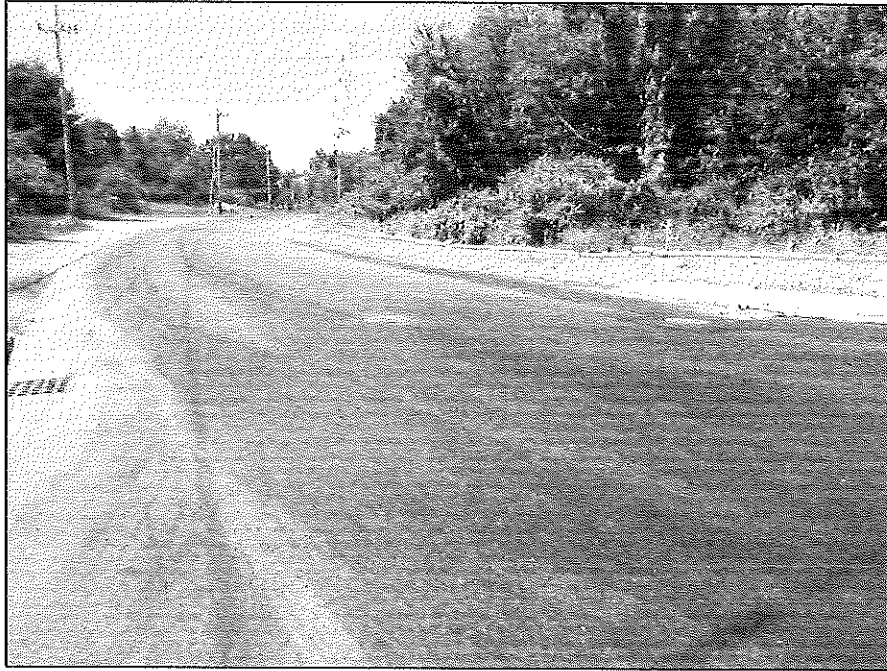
Southwest corner of Wheeler Street – tire tracks on sidewalk
